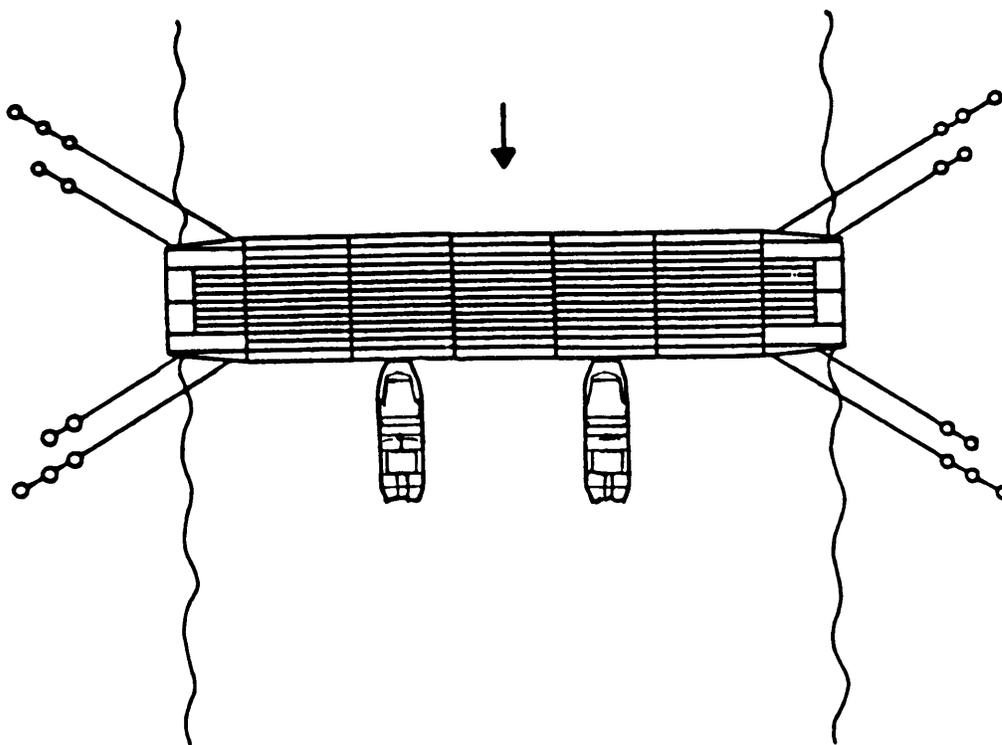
Typical Configuration Bridge Boat Anchoring.
